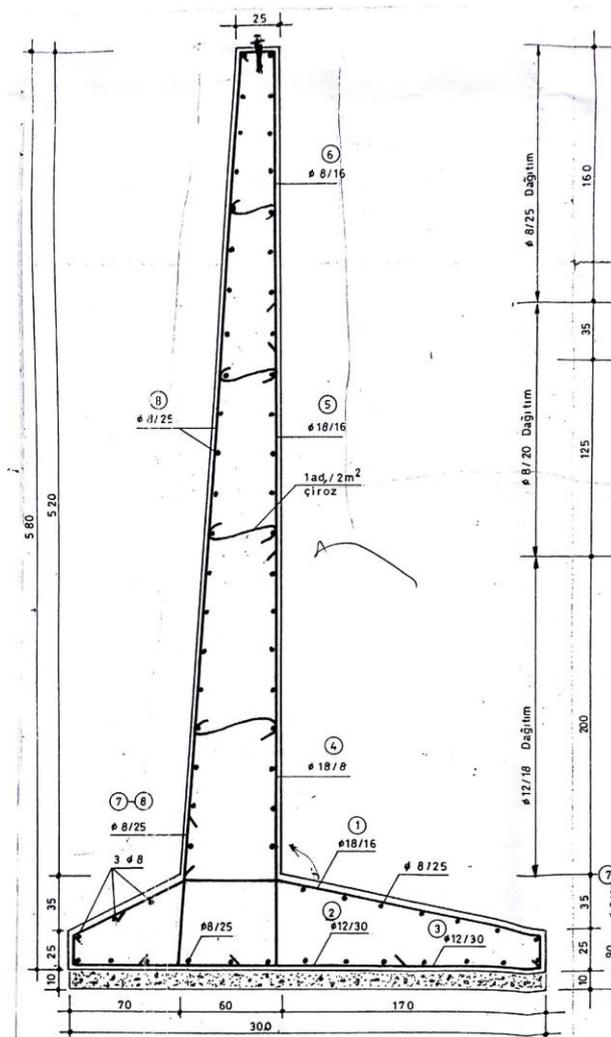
Typical cross-section and reinforcement detail of the existin RC wall.
